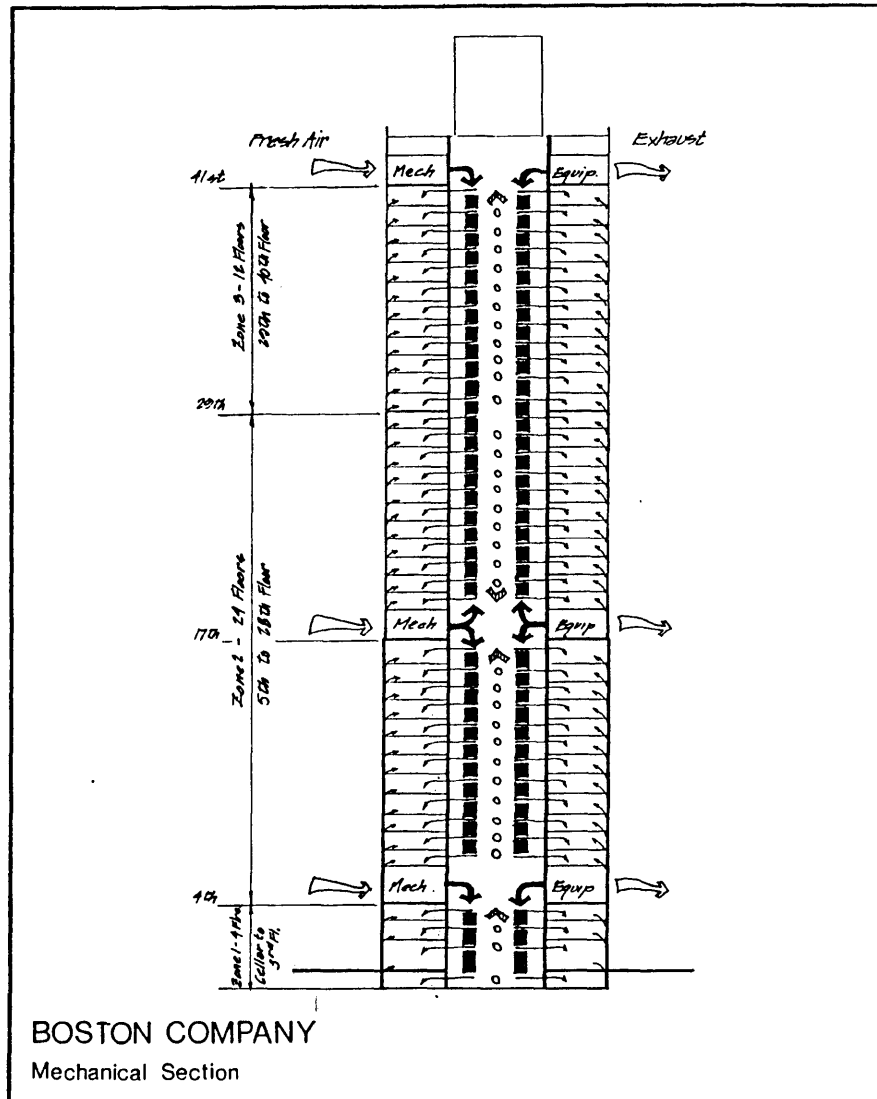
Typical Center Core Section, showing Mechanical Spaces
